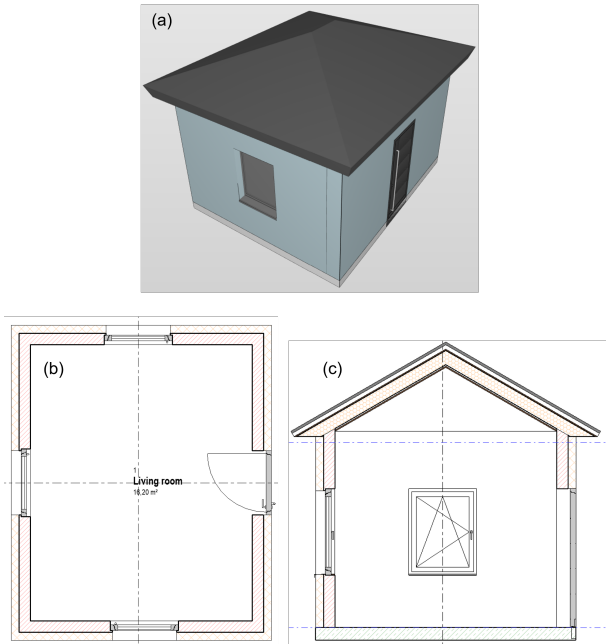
IFC Model (a) of case study building including floor plan (b) and section (c).
